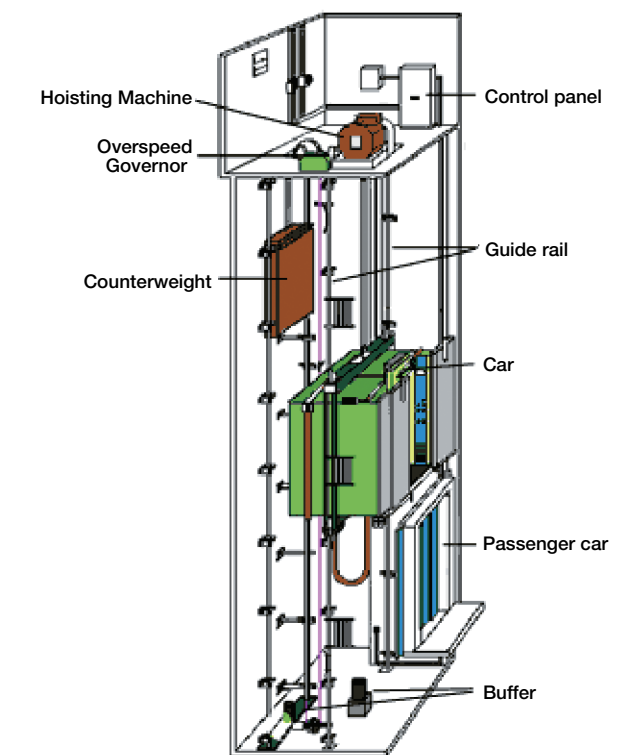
Construction of -Elevators (Electric Lifts) (Source: Japan Elevator Association's homepage)
